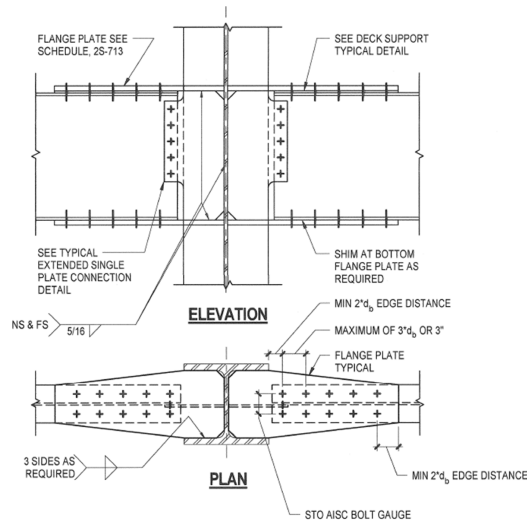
Bolted Flange Plate Collector Connection (Courtesy of The Herrick Corporation)
